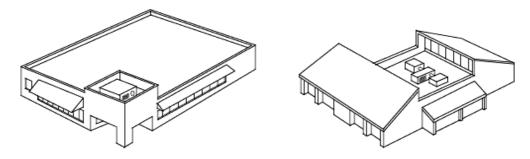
Examples of how to screen roof-mounted mechanical equipment.
